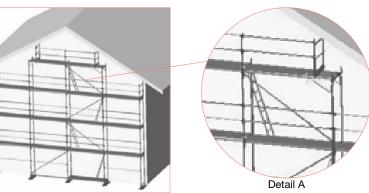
Gable set-up with bay shortened from 3.07 m to 2.57 m with the use of e285550 bracket
